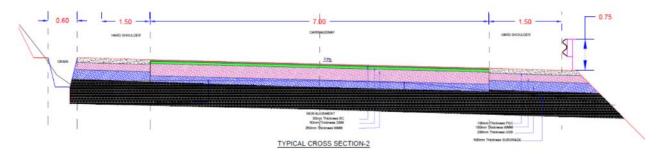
TYPICAL CROSS-SECTION 2 (Realignment Section)
